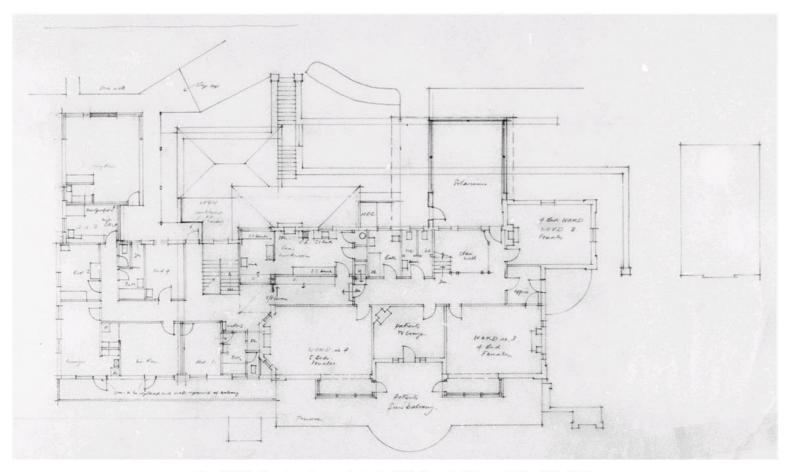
First floor plan and proposed extensions 1960s. Tasmanian Archive and Heritage Office AE417.
